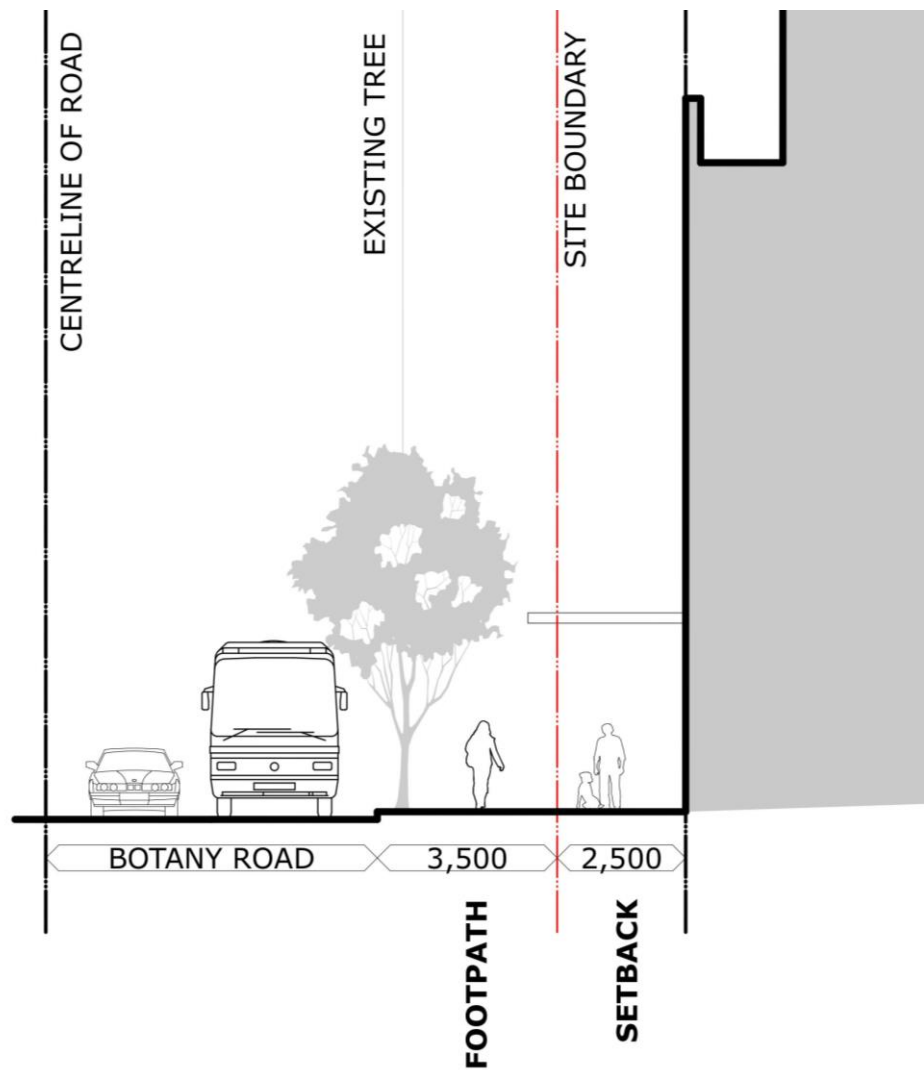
Section C - C – Main Street Typical Section – Botany Road (General)
